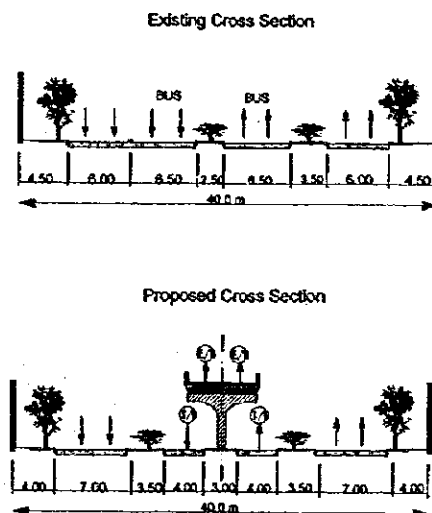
Typical Cross Section on Avenida Caracas
